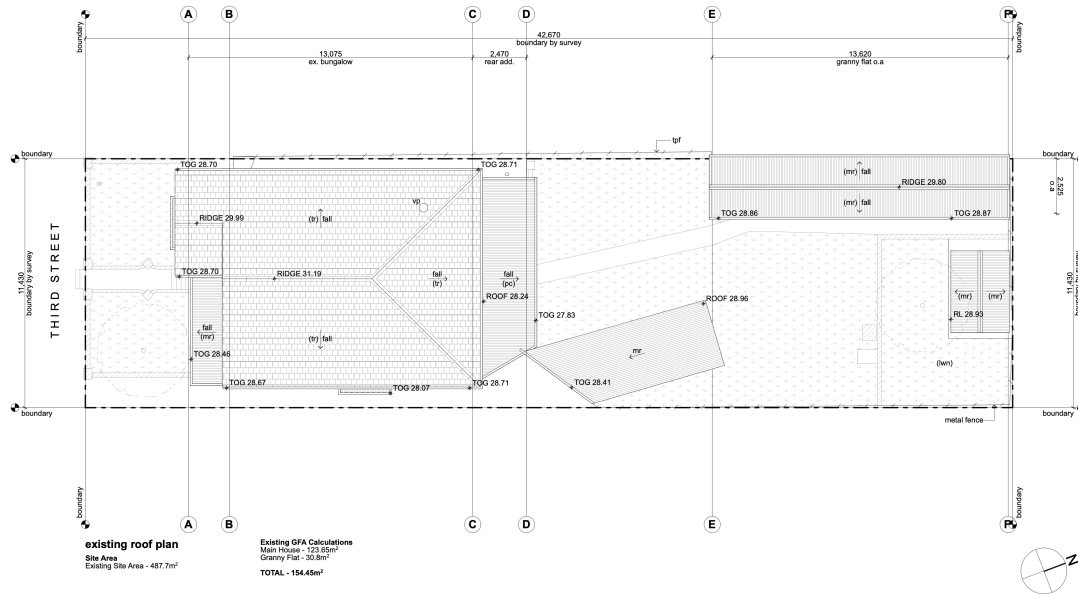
Existing Roof Plan (Source: SWAD) - Not to Scale
